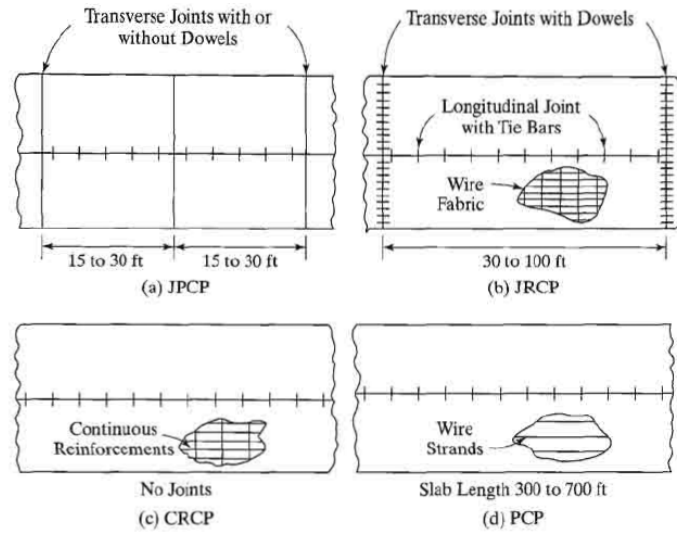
Types of concrete pavement (Huang, 2004)
